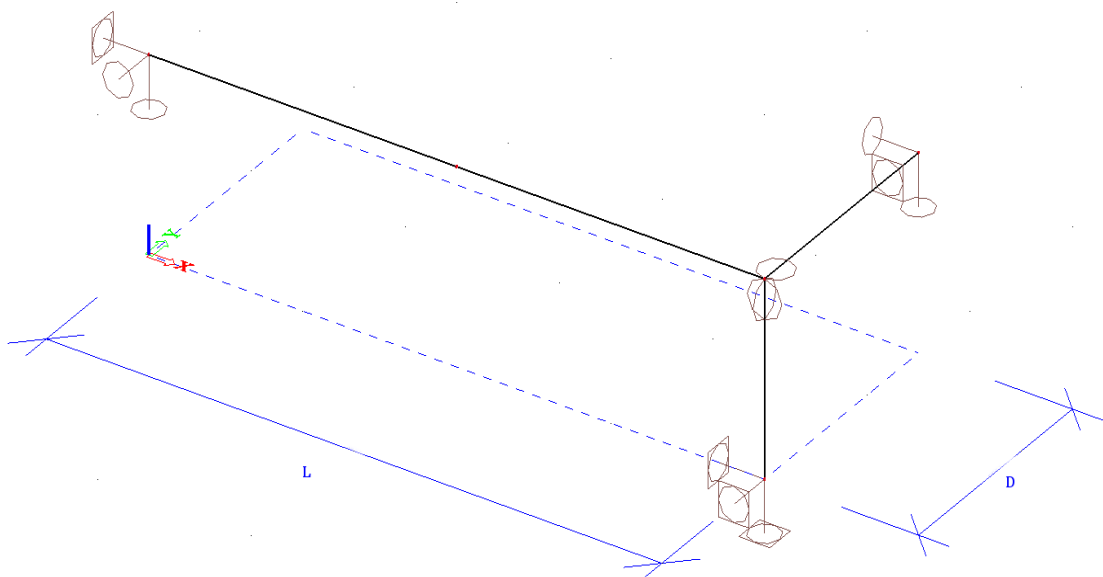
Two-sided frame with two horizontal beams and one vertical column.
